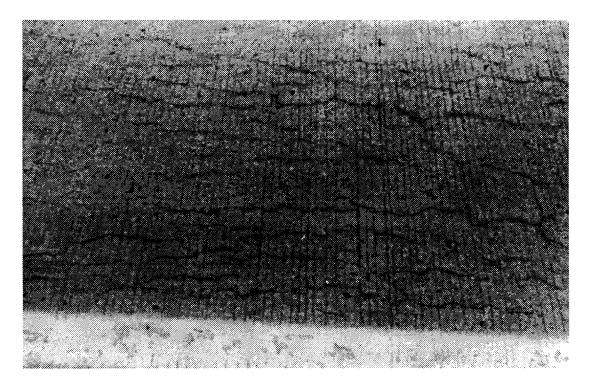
Longitudinal map cracking of continuously reinforced concrete pavement.
